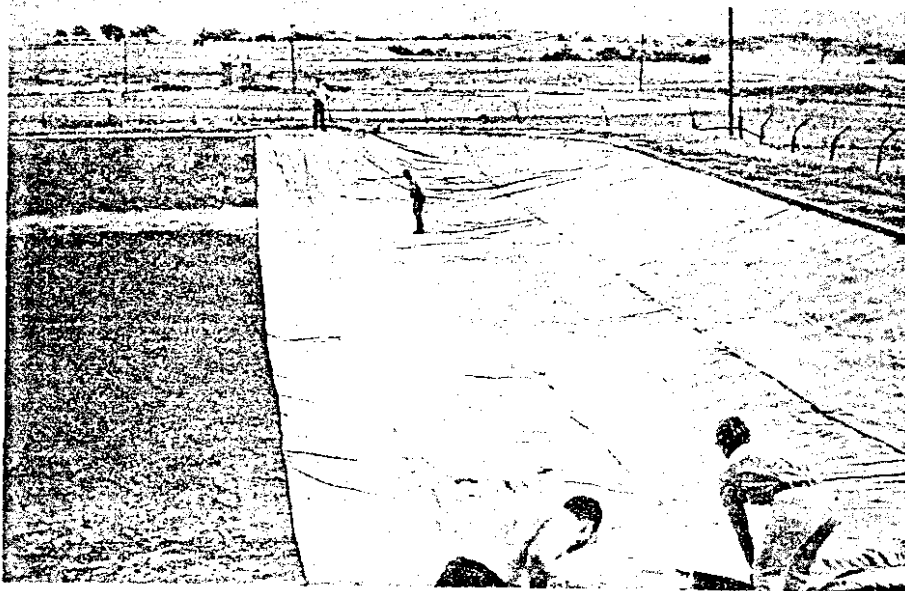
Butyl rubber liner installation. Liner was attached to concrete curb around perimeter
